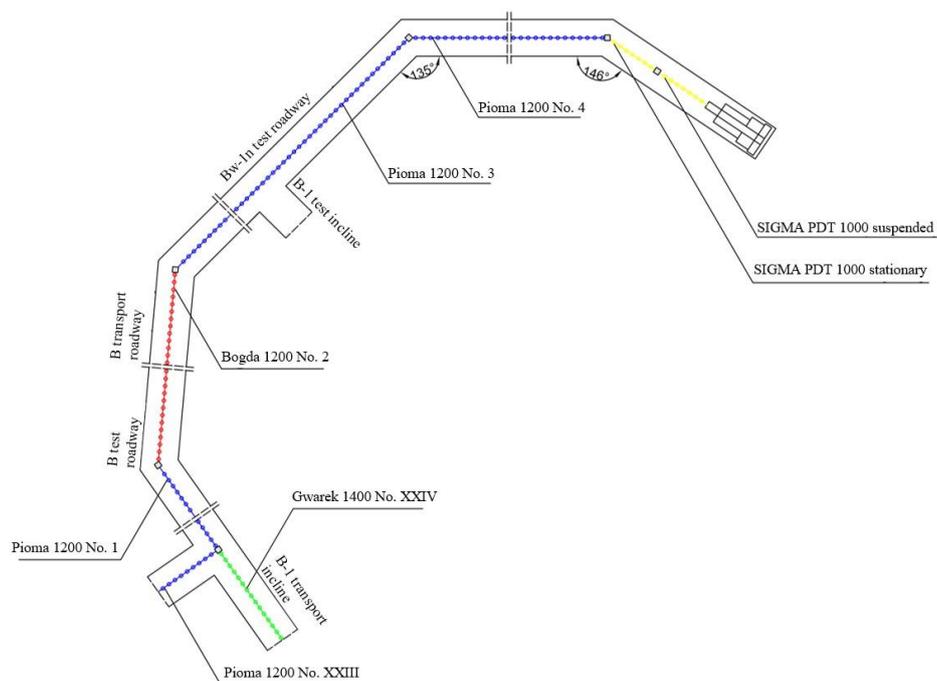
Scheme of haulage equipment configuration after having made the bend No. 2
